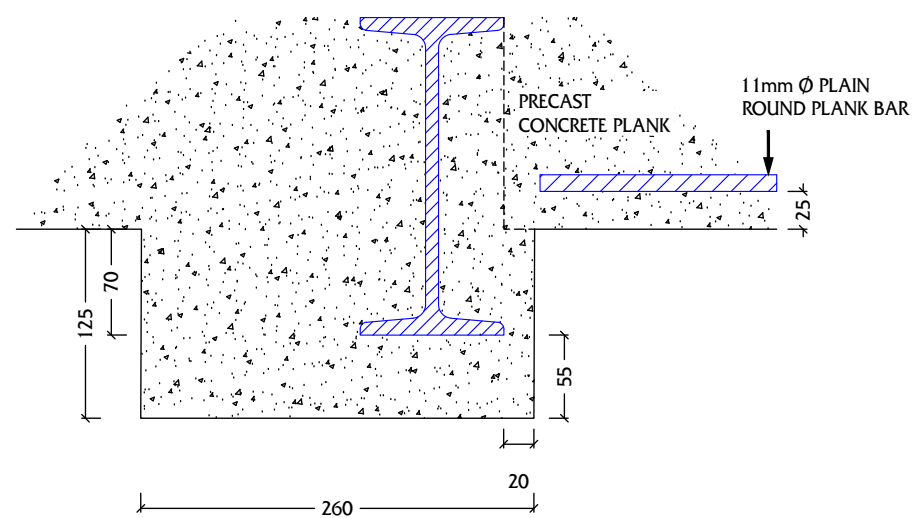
PART SECTION LOOKING WEST THROUGH 1ST FLOOR PRIMARY BEAM - SURVEY AREA Q/11-12 SCALE 1:5
